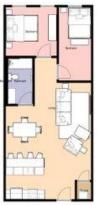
Two Bedroom and One Bathroom Unit in Buildings 623 and 625
